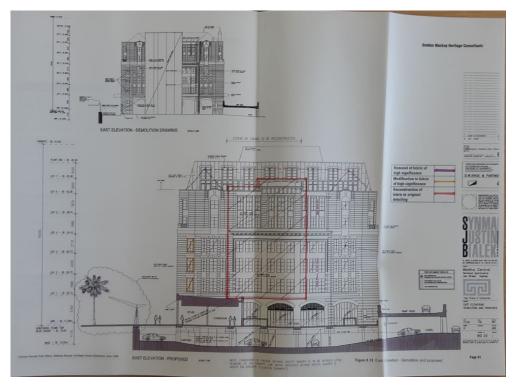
Synman Justine Bialek Architects: Medina Central Services Apartments Lee Street, Sydney. East Elevation – demolition and highlighting work to fabric of high significance.
